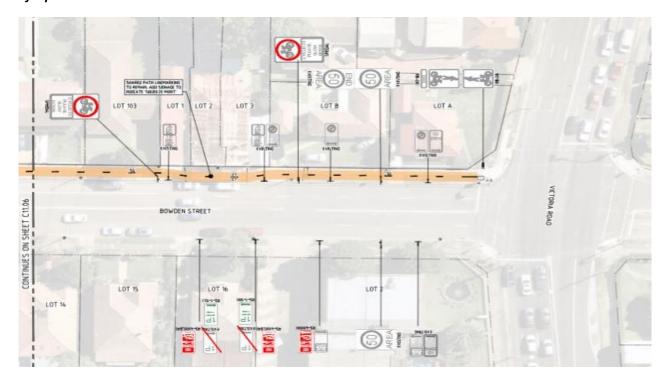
SUP on western side of Bowden Street with timed restrictions on the eastern side
